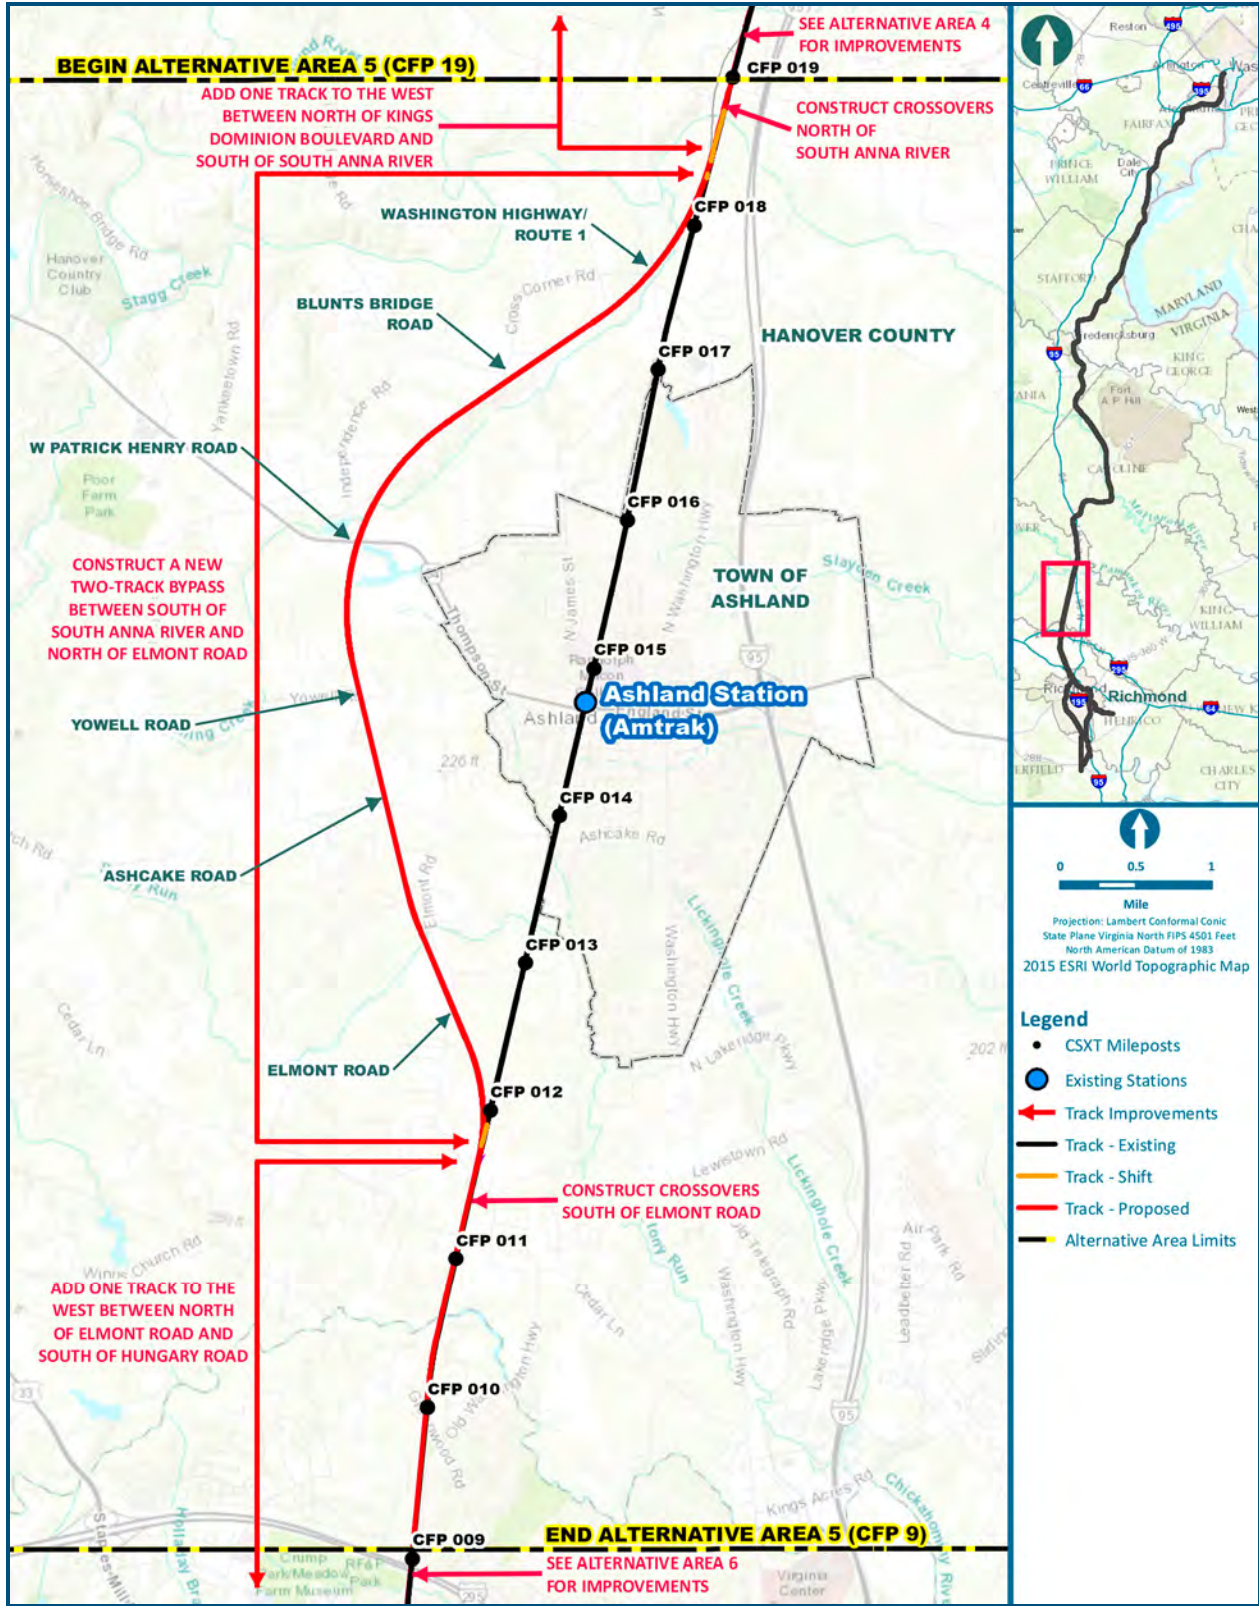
Build Alternative 5C – Add Two-Track West Bypass
